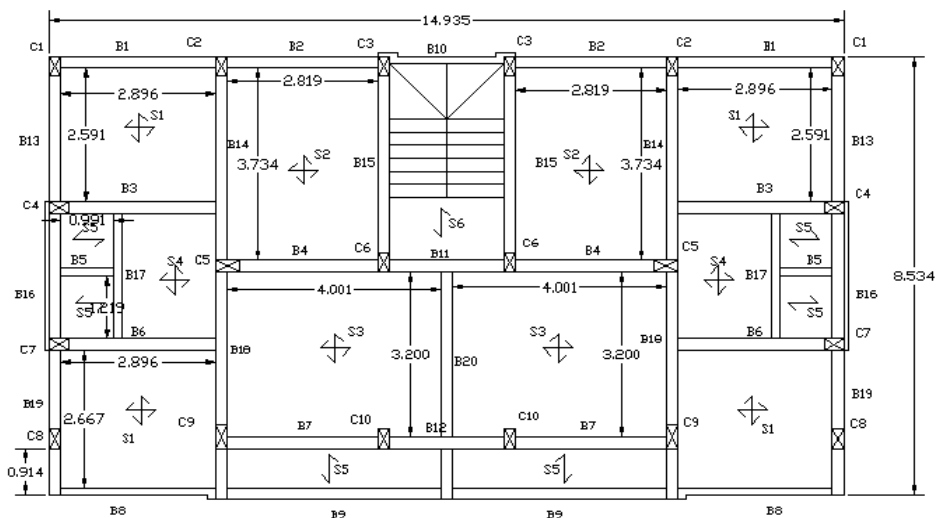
The plan of the four-storey RC building (Model-3) (units in m).
